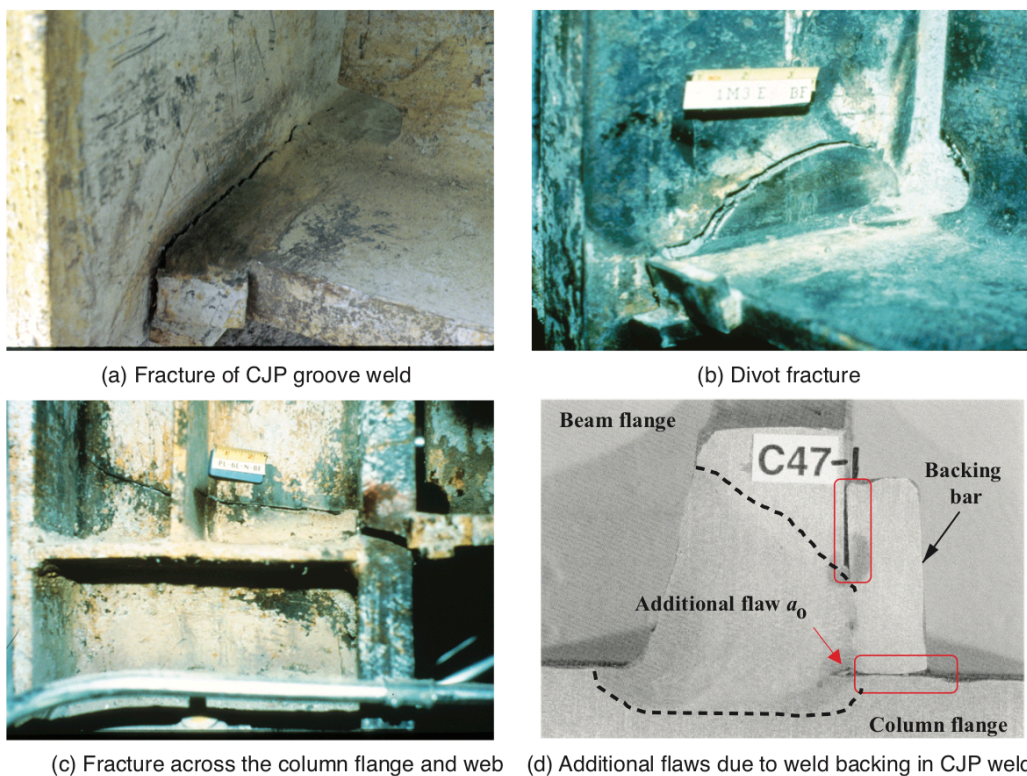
Brittle fracture failure modes in typical pre-Northridge beam-to-column connections (images “a” to “c” adopted from FEMA 2000; image “d” photo credit to Prof. Dr. J. Fisher, adopted from Paret 2000)
